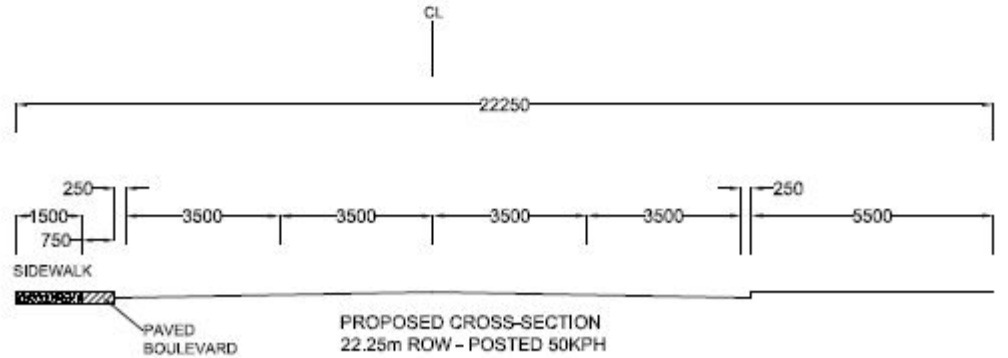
Proposed Section 5 – Hwy 7 East of 3rd Street East
